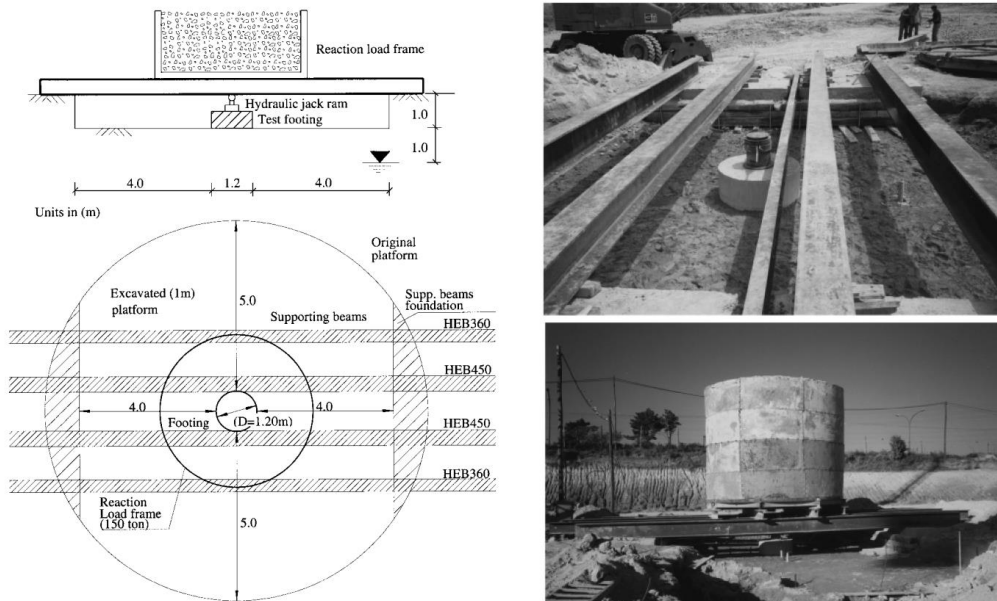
Layout for the main test and views of the site at Porto footing load test site(Fonseca 2001).
